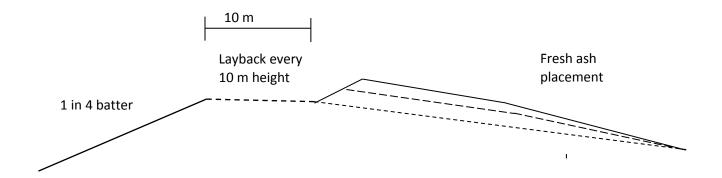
Ash bench with layback at 10 m height interval (not to scale)
